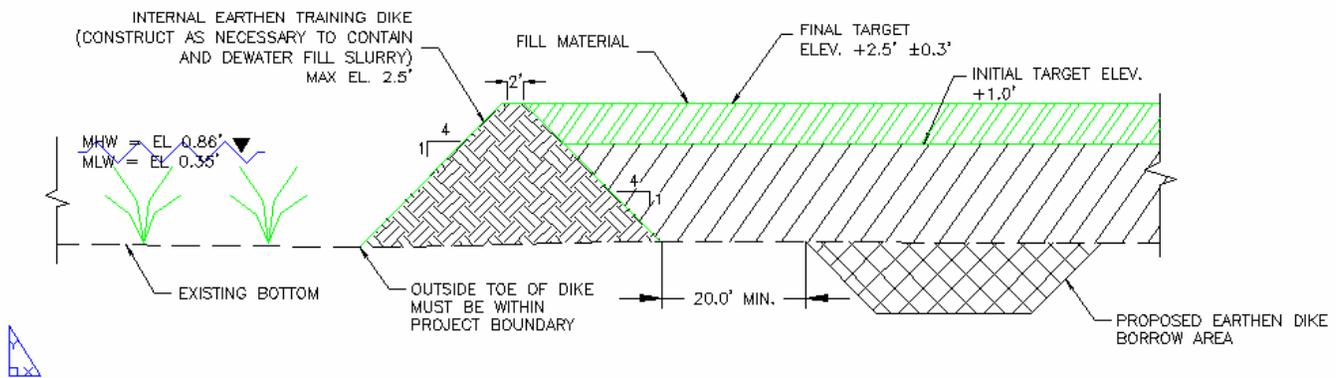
Typical Cross Section of Internal Earthen Training Dikes
